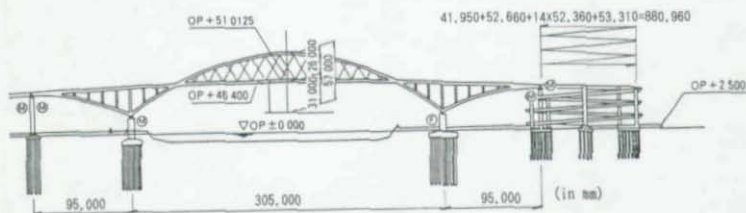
Side elevation of River Kizu Bridge and its approach spiral box girder bridge (in mm)
